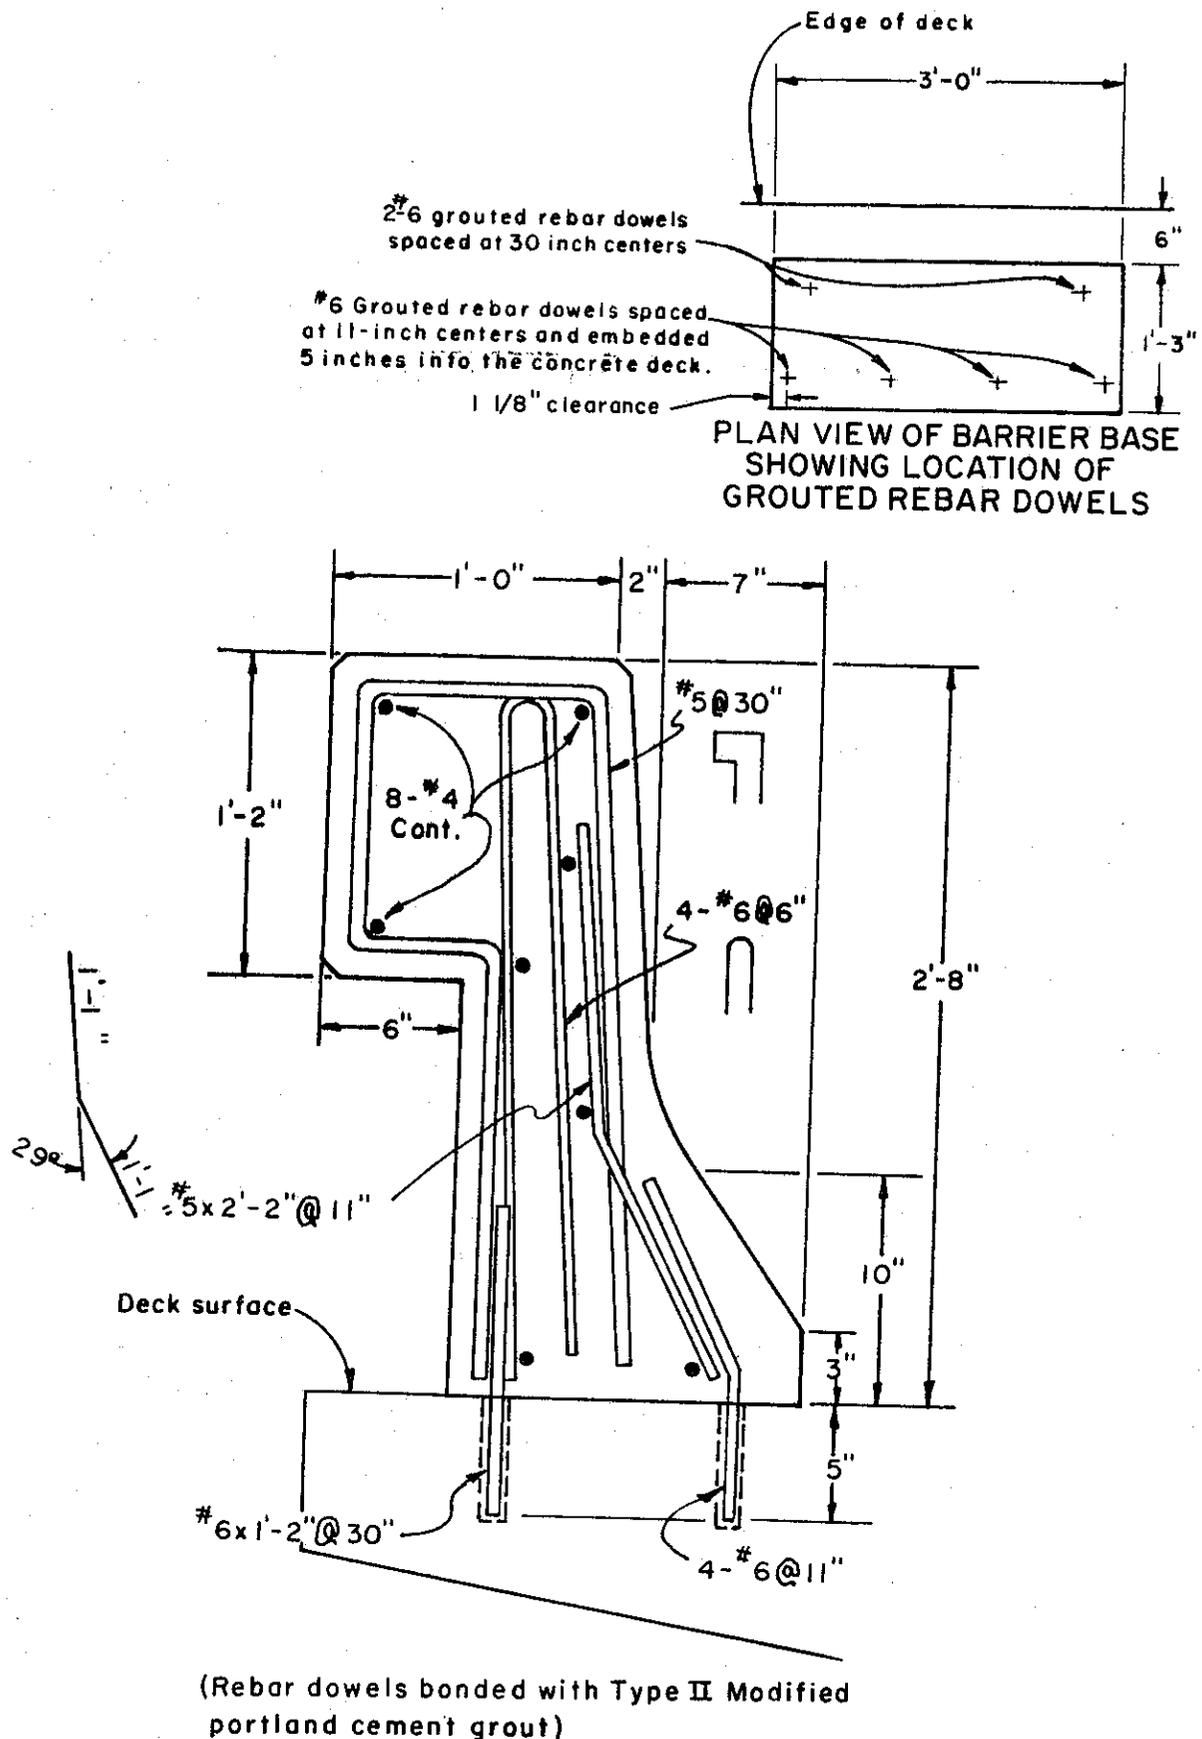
Steel reinforcement in the Type 25 Replacement Barrier prototype, anchored with #6 rebars, embedded 5 inches - Series I, Test Number 3.
